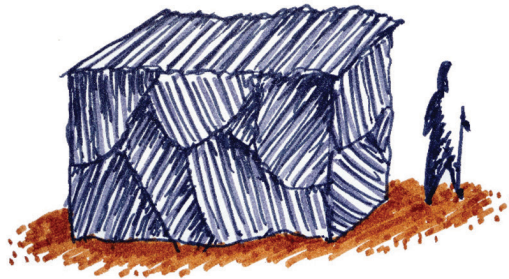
House in Mathare, Nairobi. All external walls and roof are covered with corrugated iron
